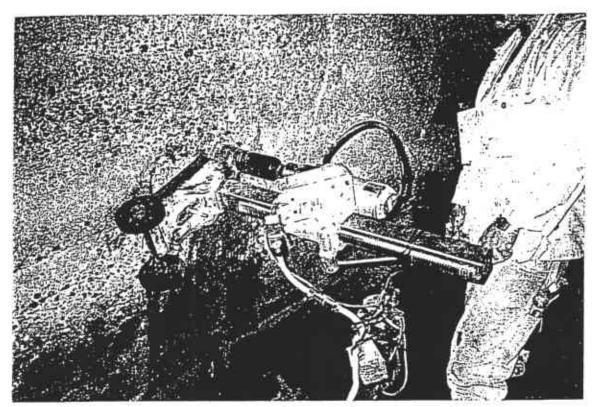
A view of typical coring operation @ Sta. 1+55 west.
